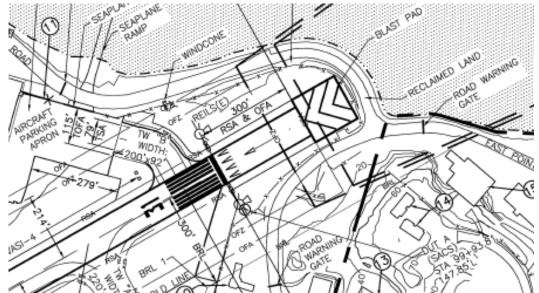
Post-construction view of the approach end of the runway 31 from DUT's Airport Layout Plan (ALP).
